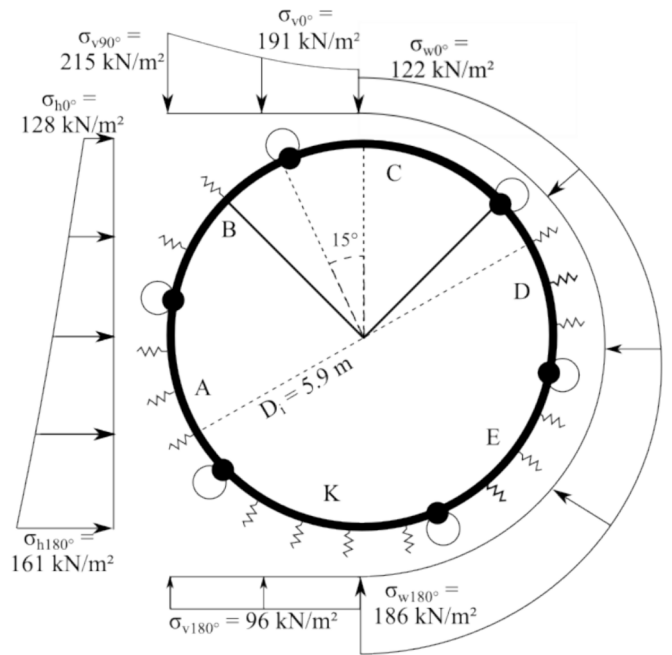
Model M4. Geometry and applied active loading due to earth pressure, water pressure, and the old existing building loads on bedded beam model.
